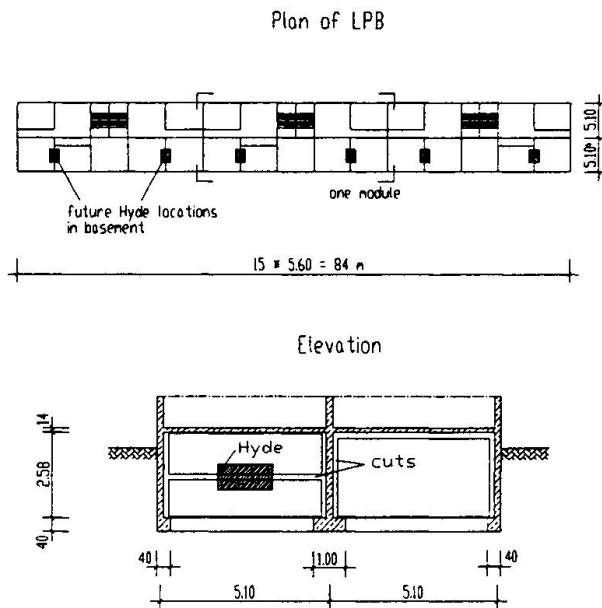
Plan and basement elevation of a typical 6 story LPB with possible Hyde locations.
